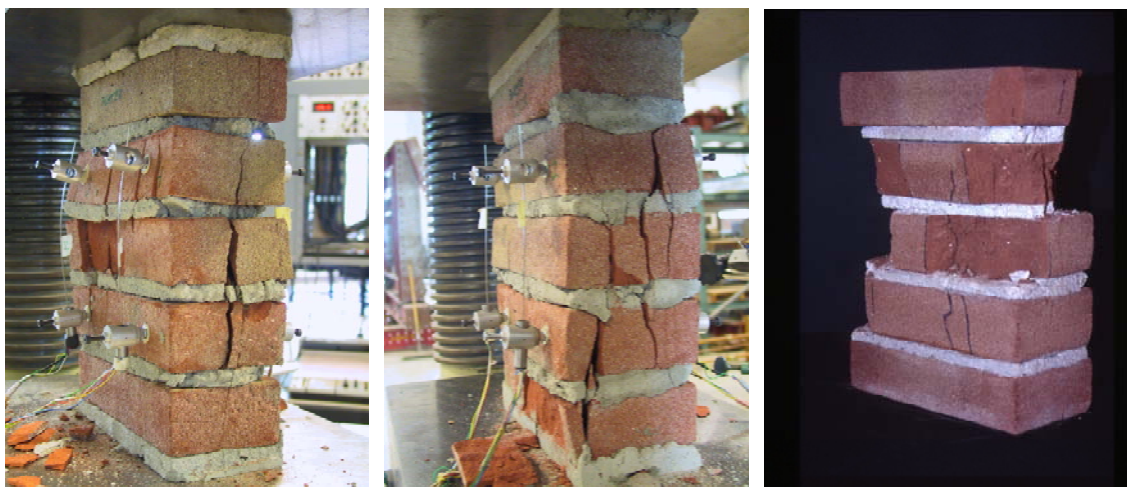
Stack bonded soft mud brick (RW) specimens built with general purpose mortar after testing beyond ultimate load. Splitting cracks and spalls are visible.
